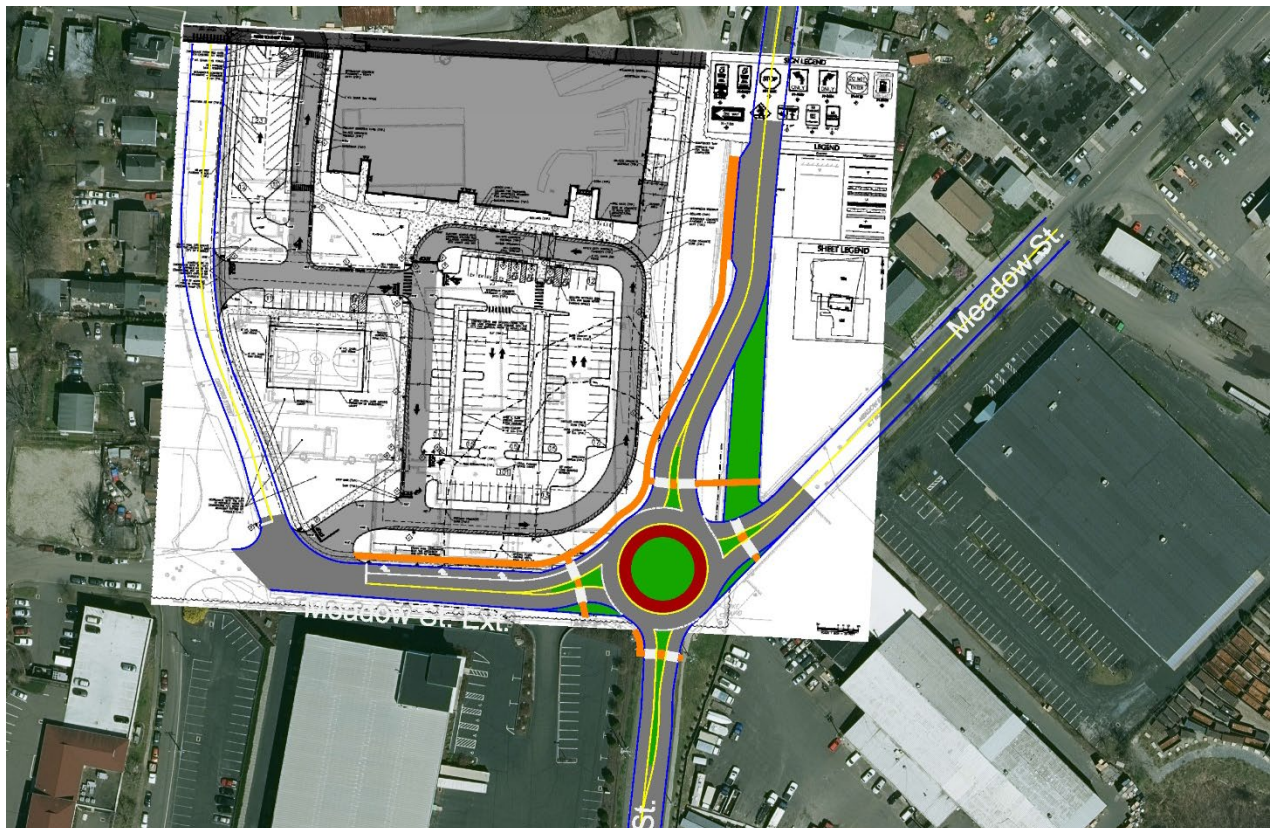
Proposed Roundabout Concept Plan – School Site Plan Background
